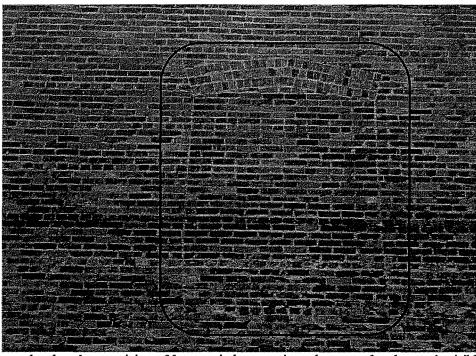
Segemental arch and mortar joints of former window openings along west façade remain visible. Looking east.
